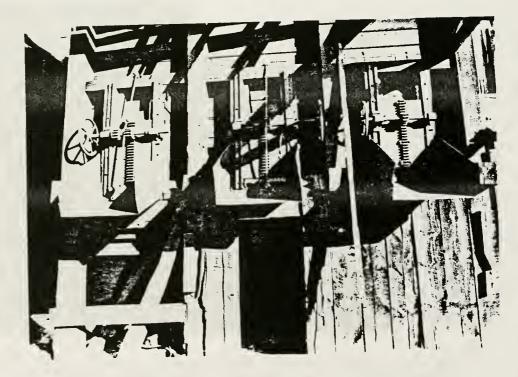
Arsenic plant (structure #59) showing detail of chutes on bins adjacent to McDougall roasting furnace, east view.
